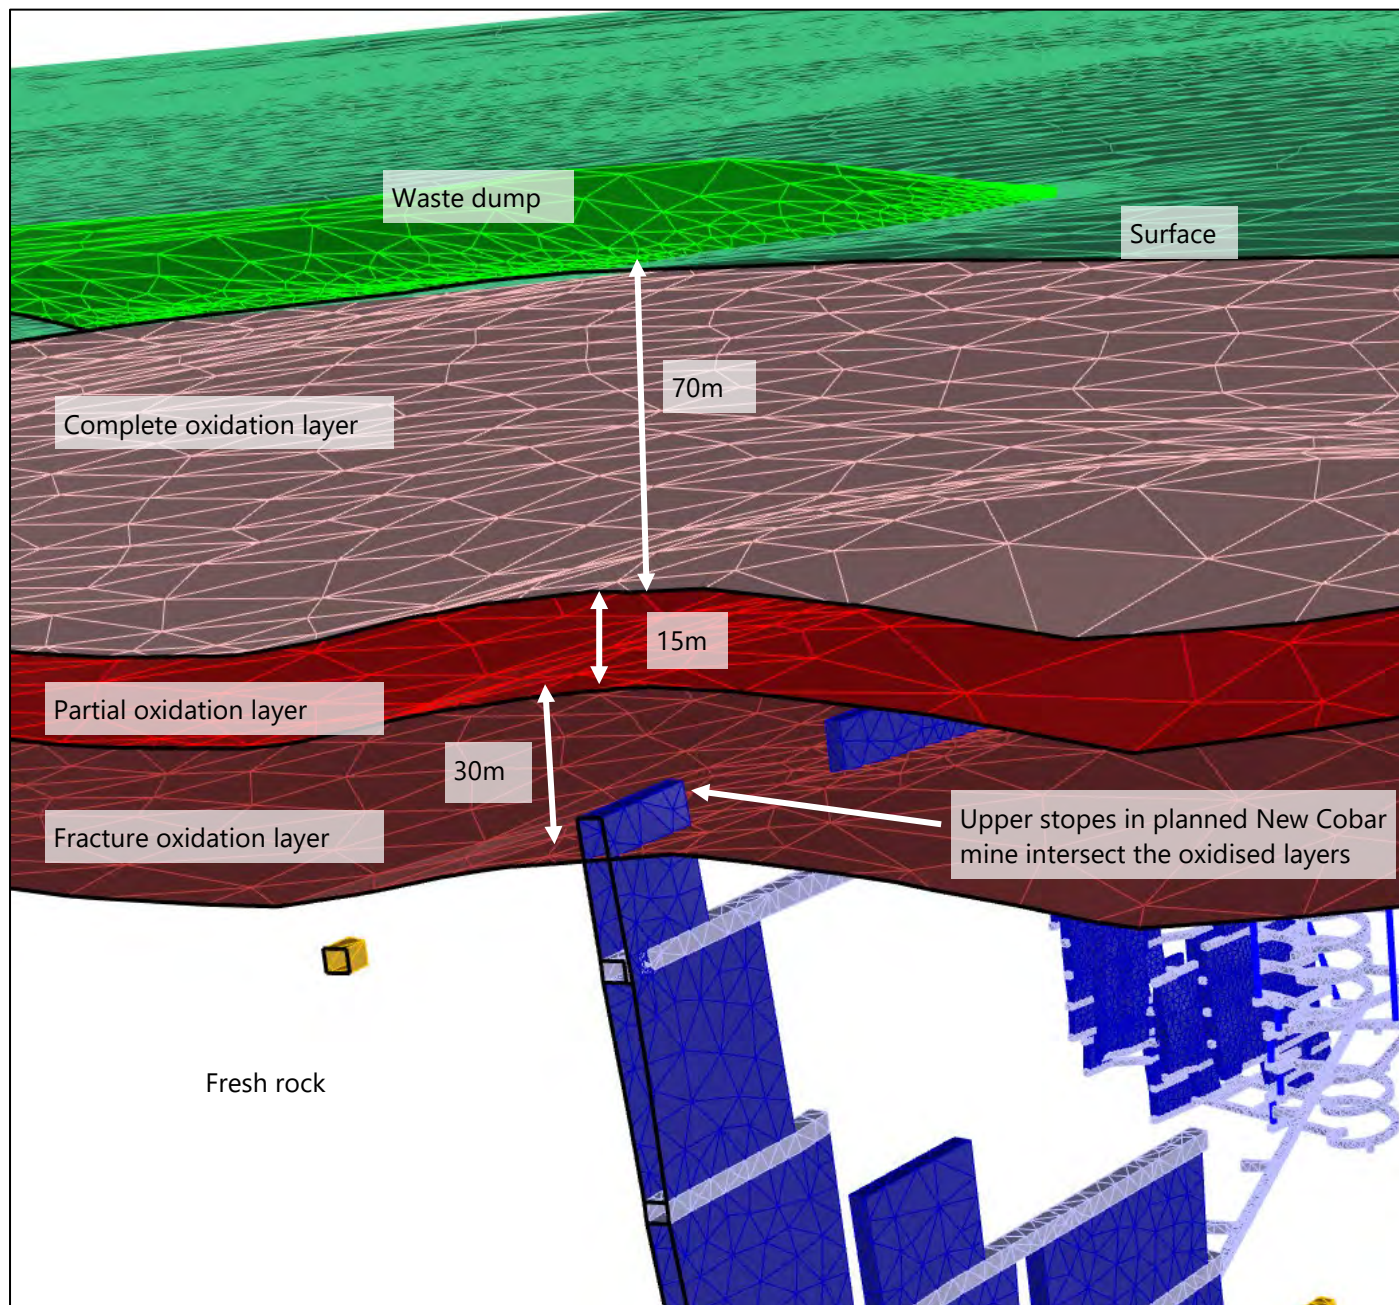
Cross section through the New Cobar mine showing planned stopes intersecting the oxidized layers (facing North West)
